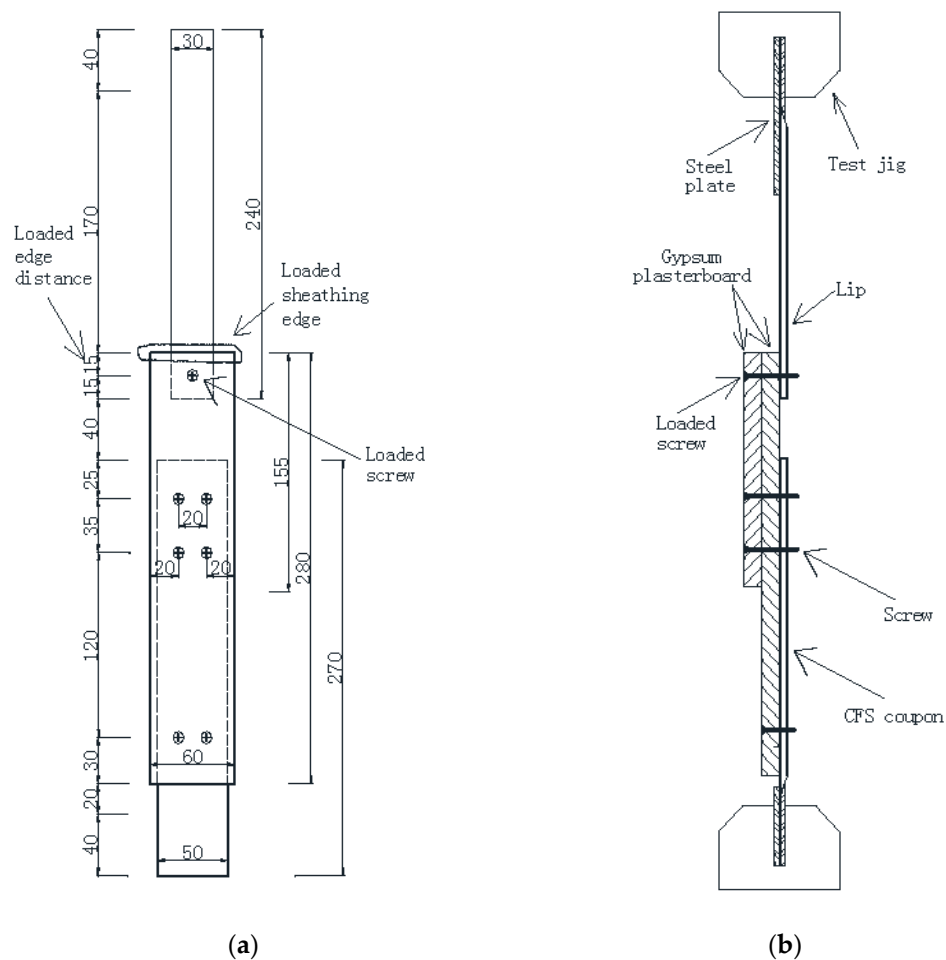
Connection details with single-layer sheathing and a loaded edge distance of 15 mm: (a) front view; and (b) side view.
